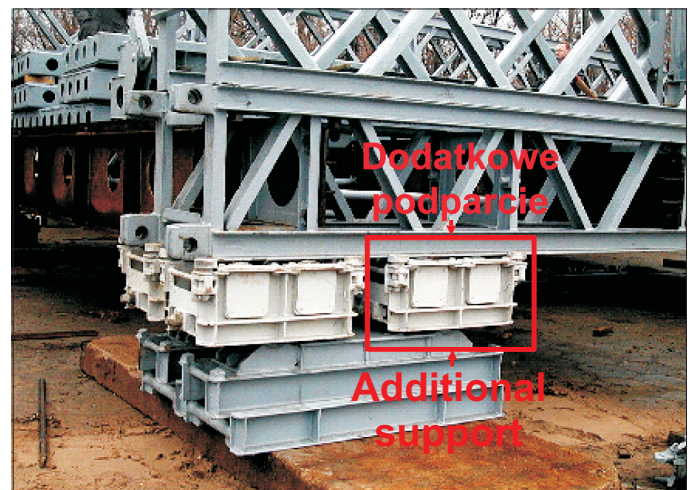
The method of supporting the widened construction of the DMS-65 bridge
